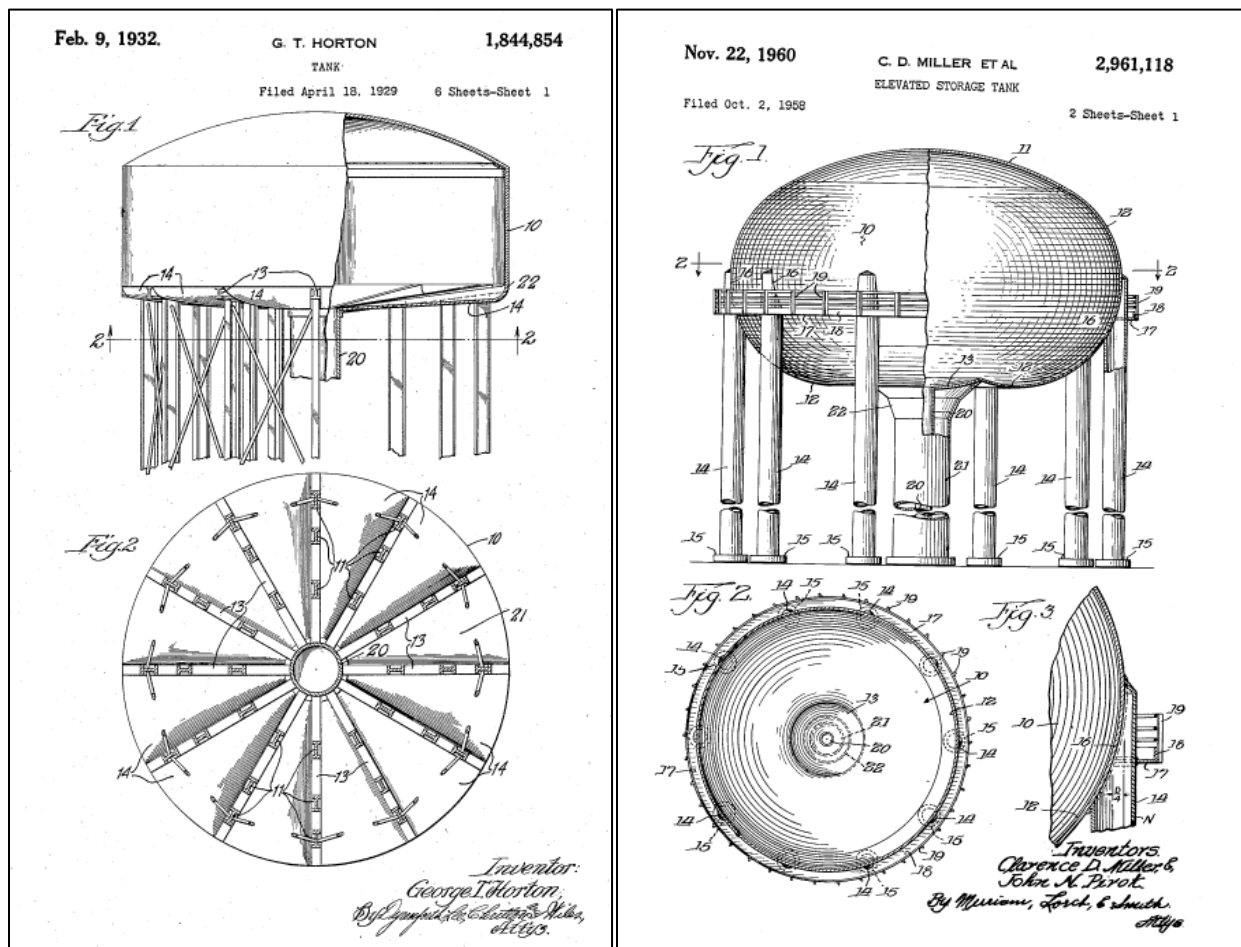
Patent designs for a radial cone tank on left and toro-spherical-type tank on right.¹⁹⁴
